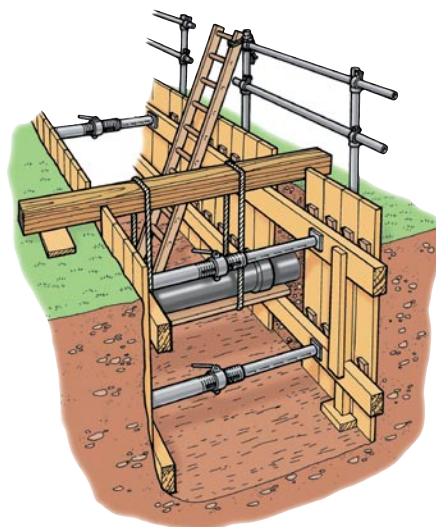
An excavation supported by timbering and props with guard rails (omitted from left-hand side for clarity) to prevent falls. Extended poling boards act as toe boards, safe access is provided by a tied ladder and exposed services are supported
